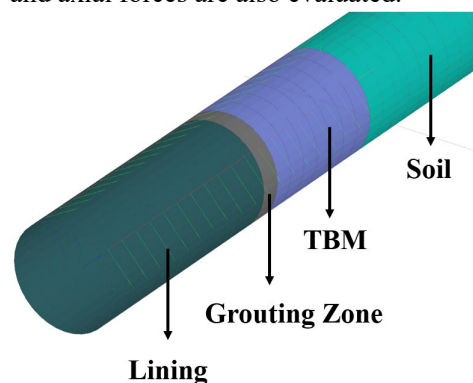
Layout of the shield, grouting zone and tunnel segments in the model
